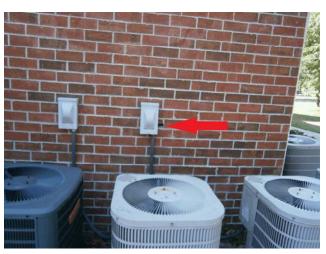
Hole in brick veneer near HVAV disconnect
